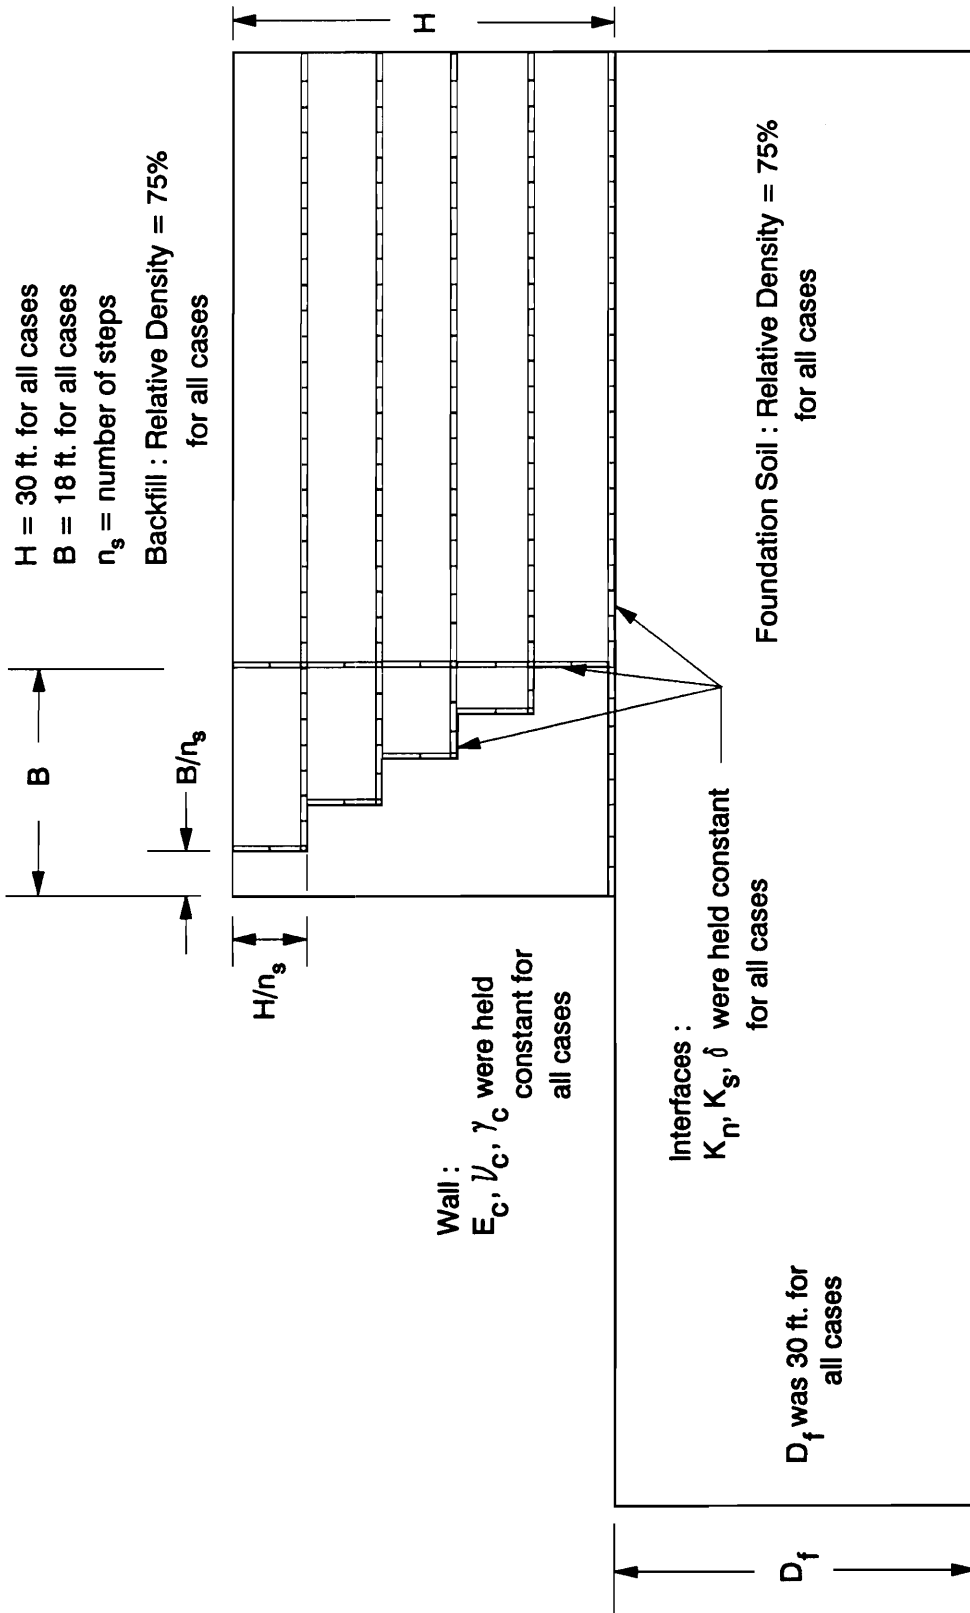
Hypothetical Wall-Foundation System used for Backfill Placement Analyses of Stepped-face Walls
